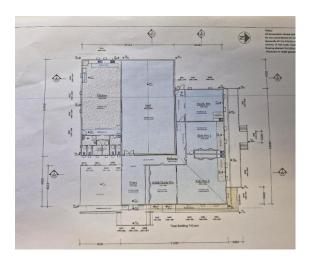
Floor Plan (Source: Coppermine CAD Services Ltd)
